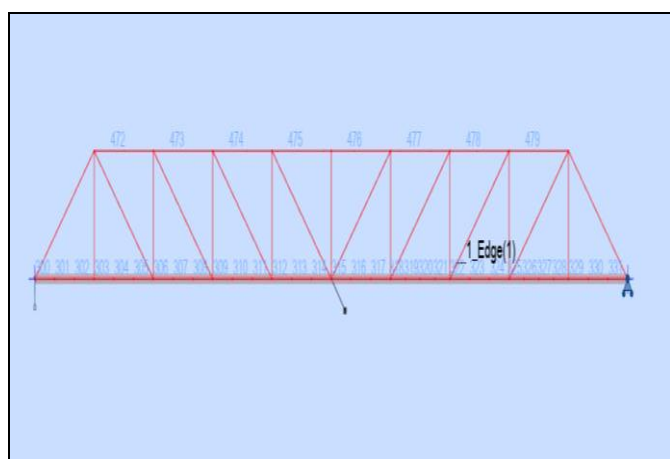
(Front View) 2-D Line Plan of Pratt Truss bridge.
